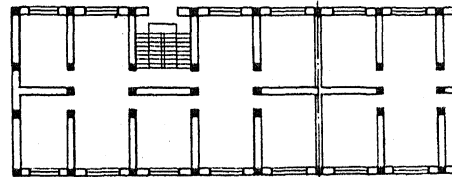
MASONRY STRENGTHENED WITH REINFORCED CONCRETE POSTS AND BELTS
